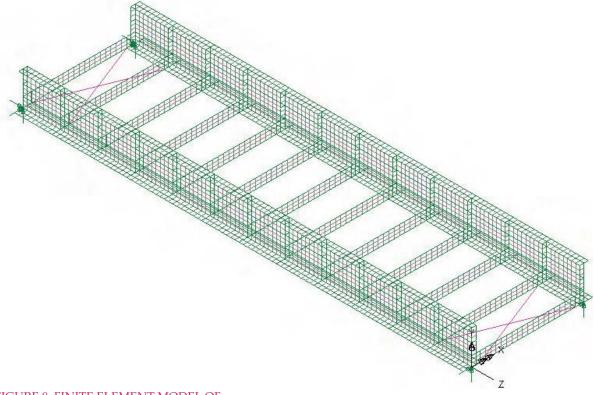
FINITE ELEMENT MODEL OF HALF-THROUGH BRIDGE
